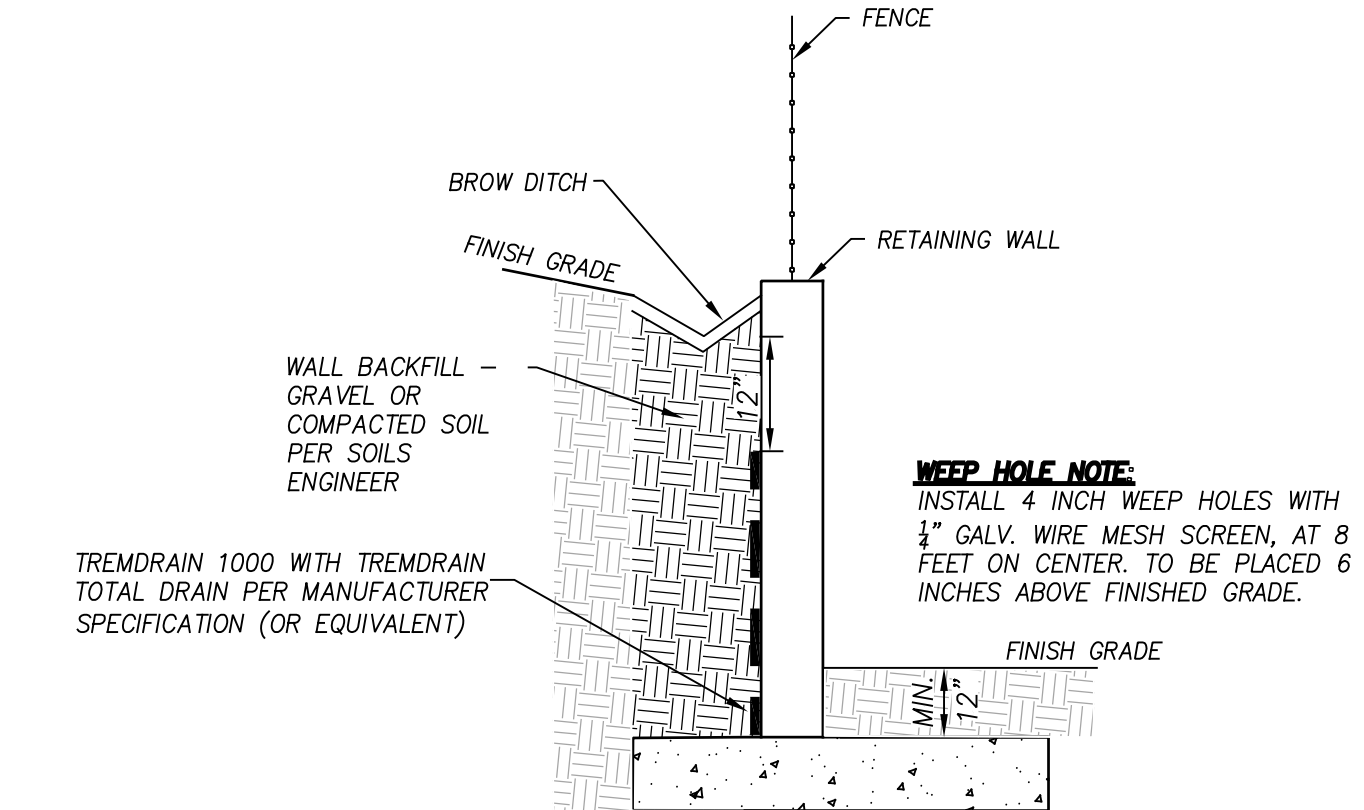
DETAIL: BROW DITCH BEHIND WALL W/ STEMWALL (PRIVATE)
